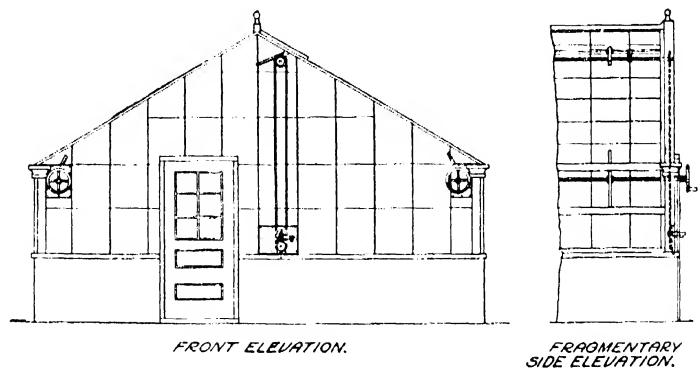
Arrangement for opening roof and side ventilators from outside the end of the greenhouse
